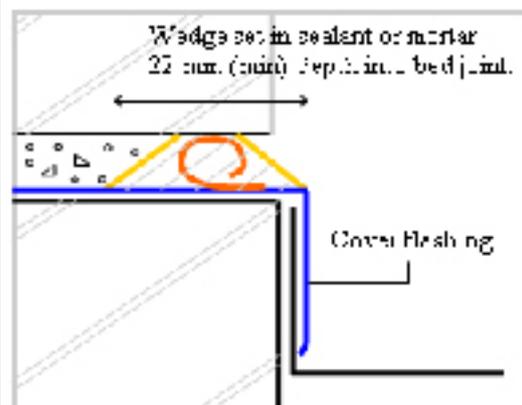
Masonry fixing wedge system pressing down on apron flashing
